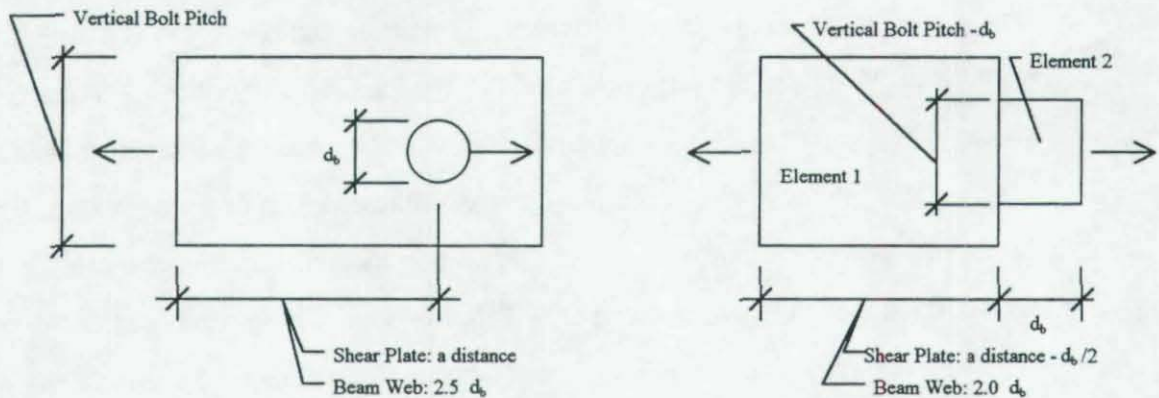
Modeling Shear Plate And Beam Web Flexibility
